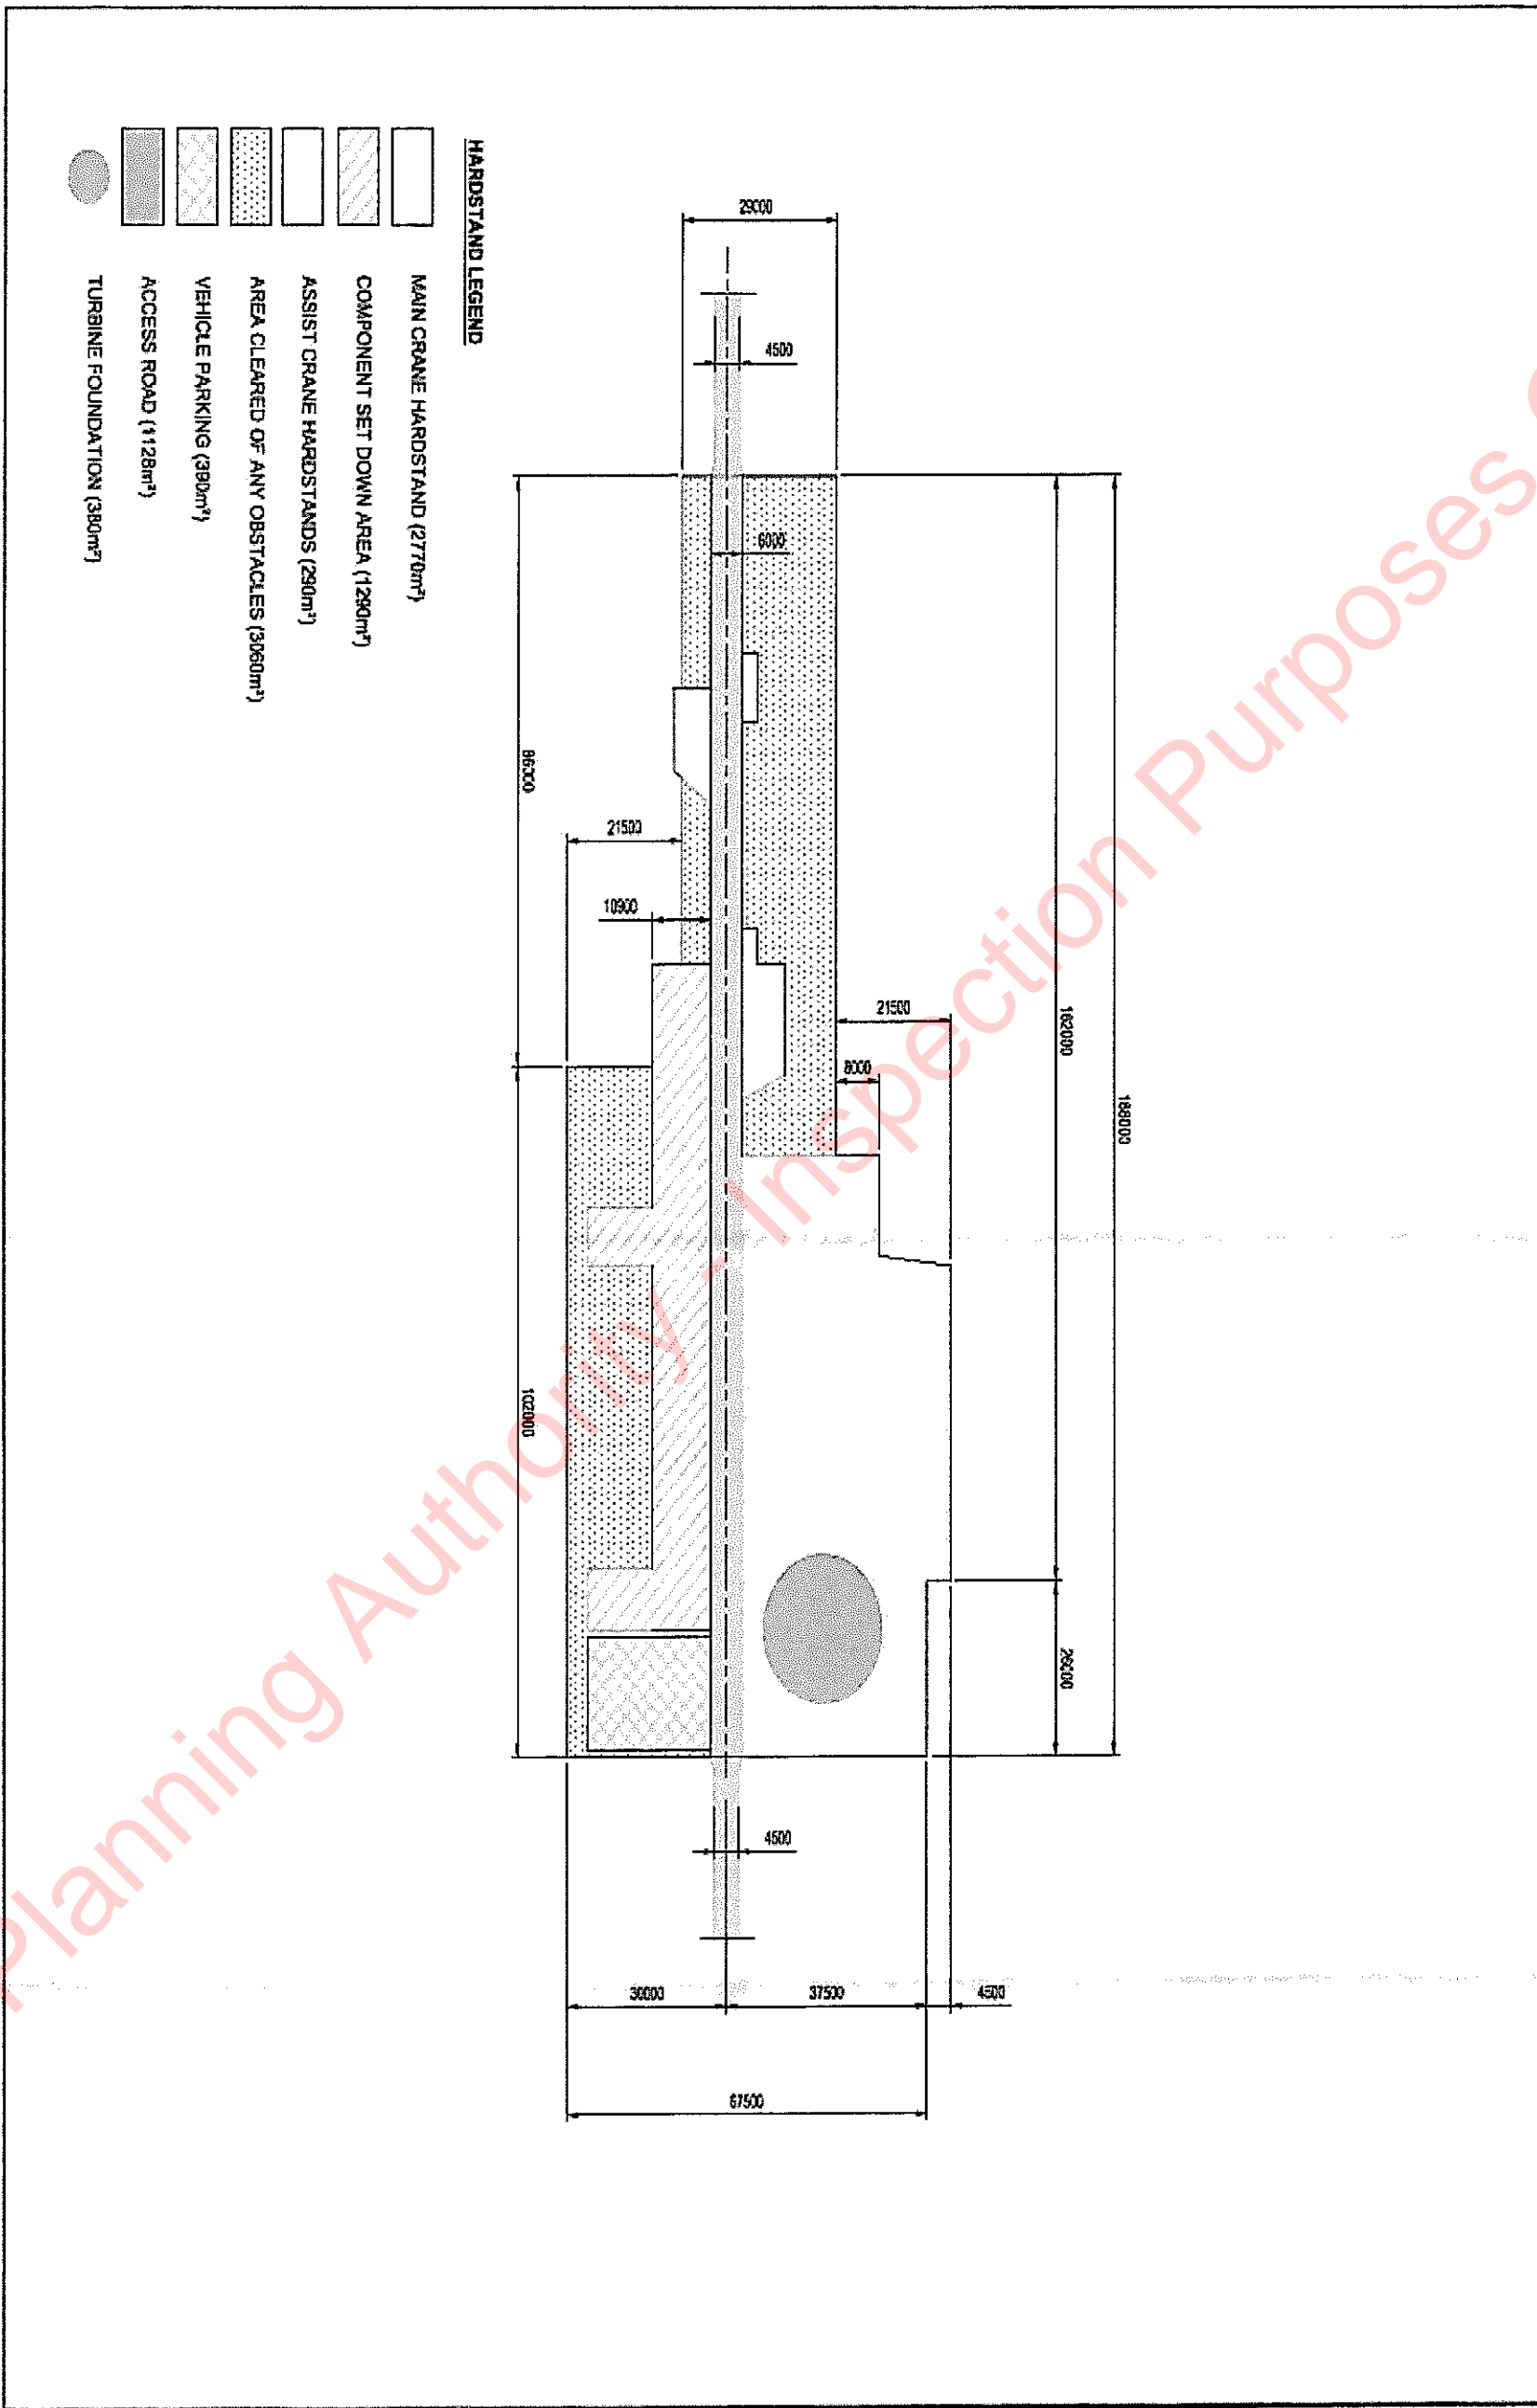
Crane Pad Hardstand Design (Excerpt from Drawing No. 6226-PL-601)
